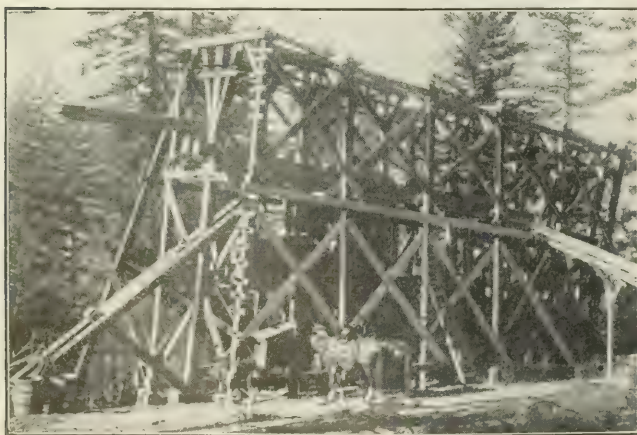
DOUBLE TENSION TOWER OF CABLEWAY
